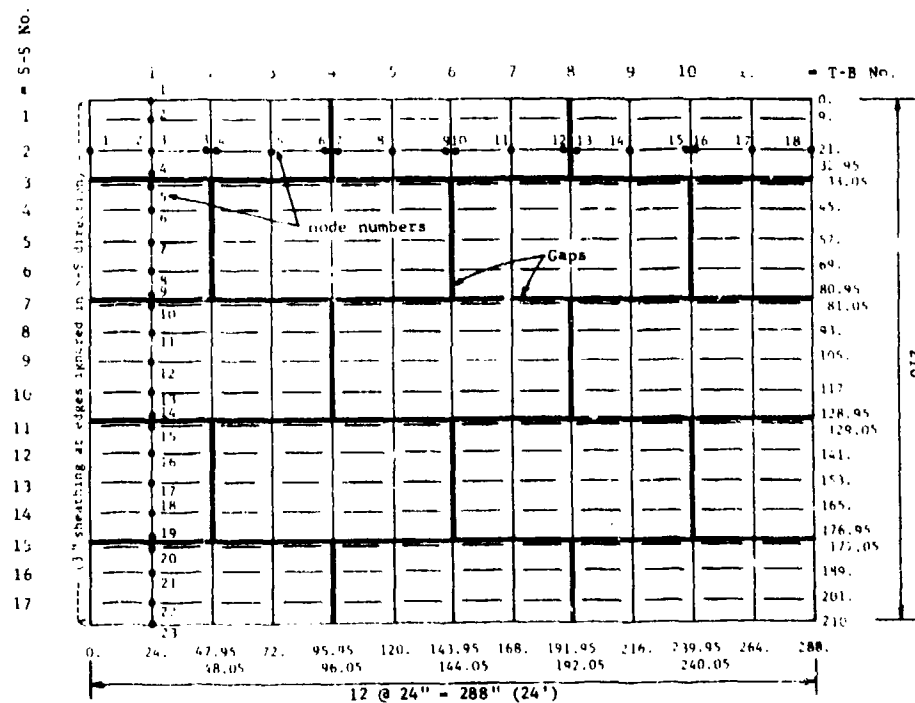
Details of CSU floor analyses, floors 8 and 9.
